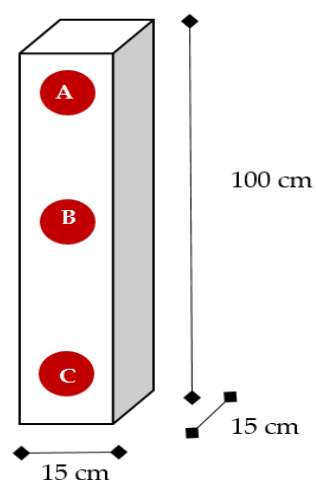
Column dimension and The zones A, B, C, for drilling concrete cores
